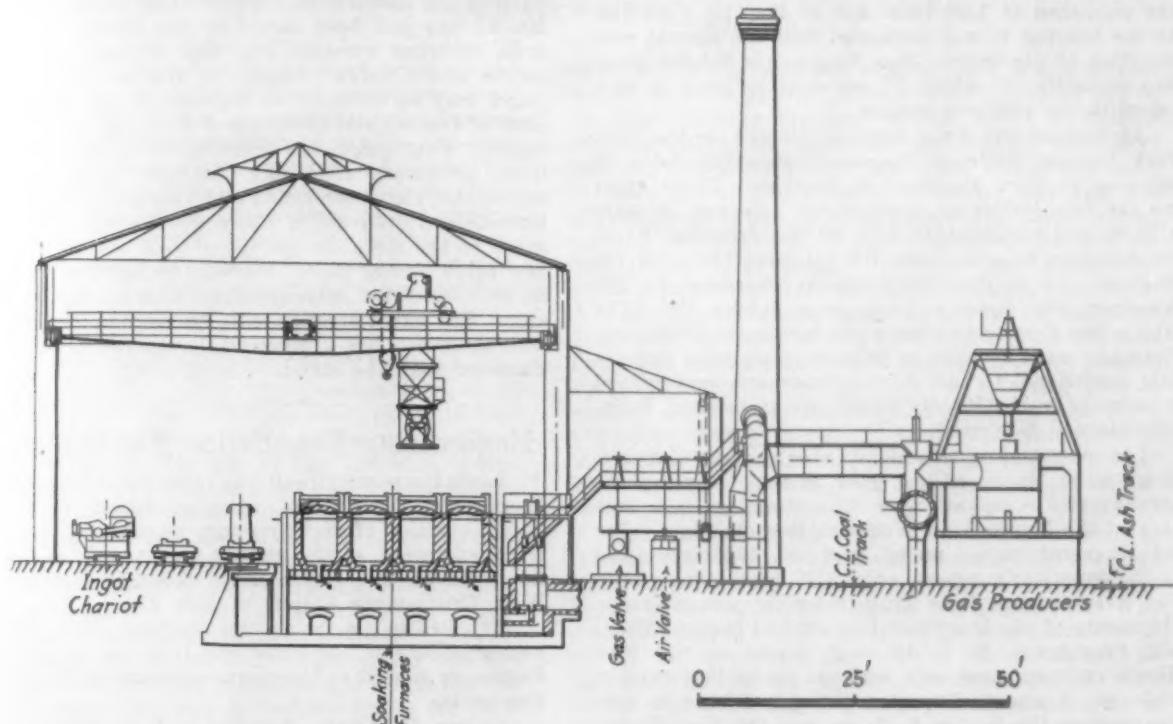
General Arrangement Section Through Producers and Soaking Pits, with Ingot Chariot at Left. The row of gas producers adjoins a similar, but longer, row serving the open-hearth furnaces, and located beyond the right end of this drawing
